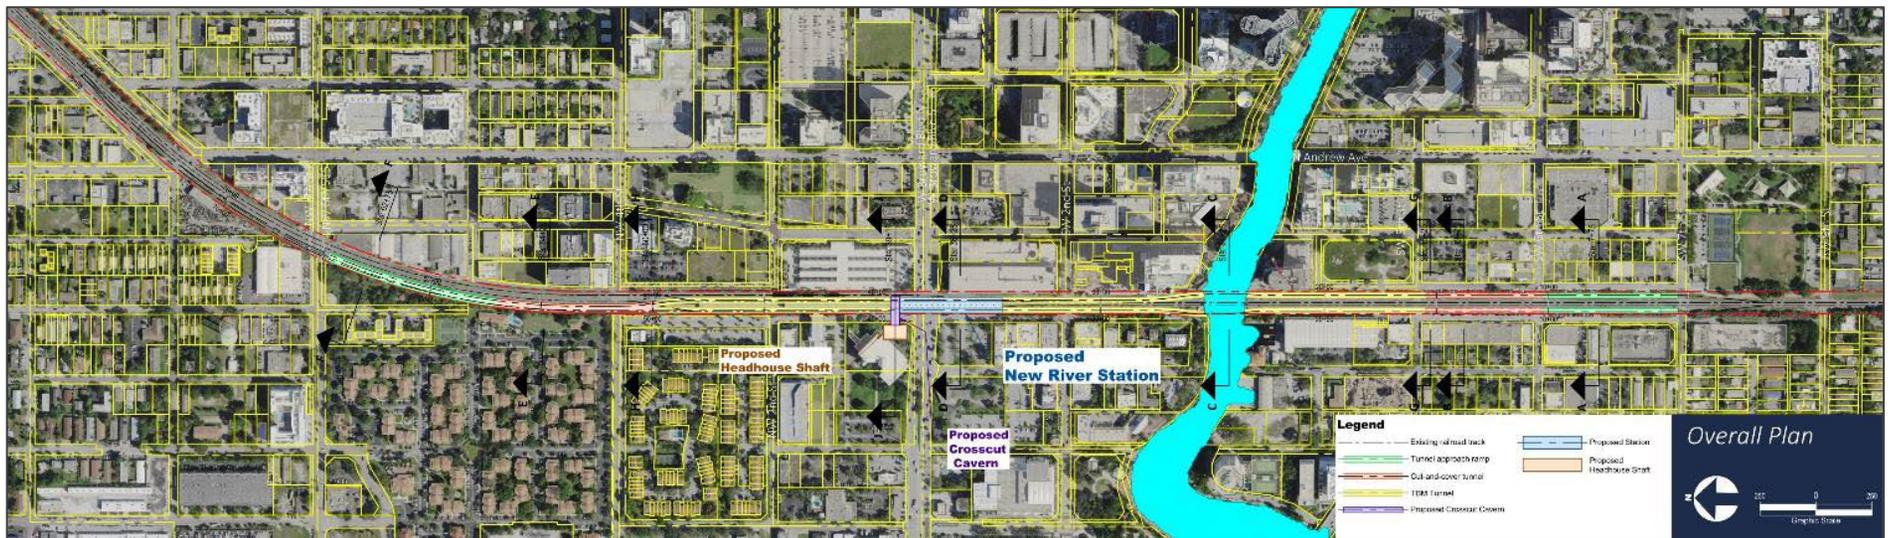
Tunnel Alignment from Sistrunk Blvd. to SW 7th St.
